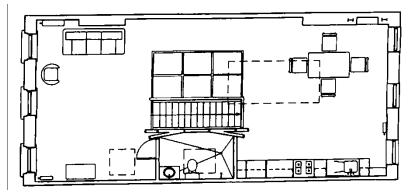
The plan of the linear kitchen design (Asensio, 2006)
